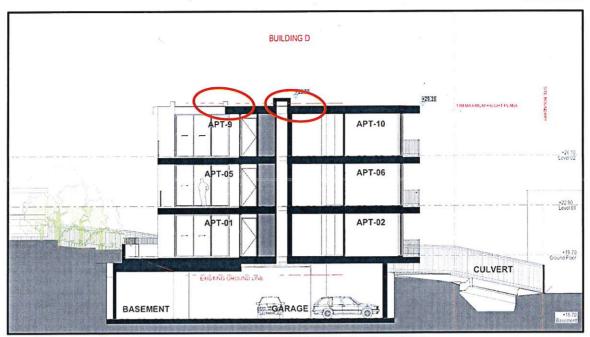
EXCERPT OF SECTION PLAN SHOWING VENTS AND LIFT OVERRUN (SOURCE: POPOV BASS)
